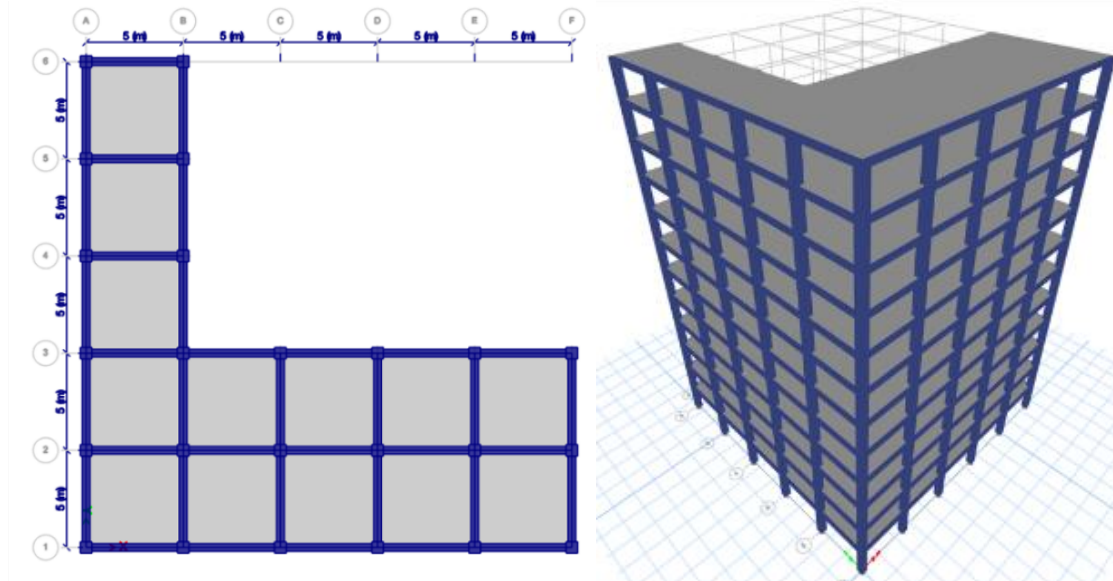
Plan and 3D View of a 12-Story Irregular RC Building.
